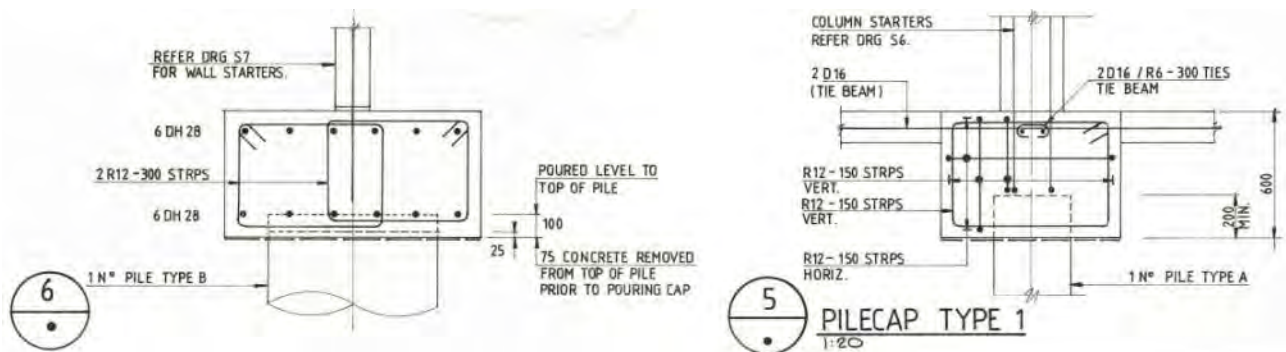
Extract from as-built drawings - showing foundation beams and pile caps
